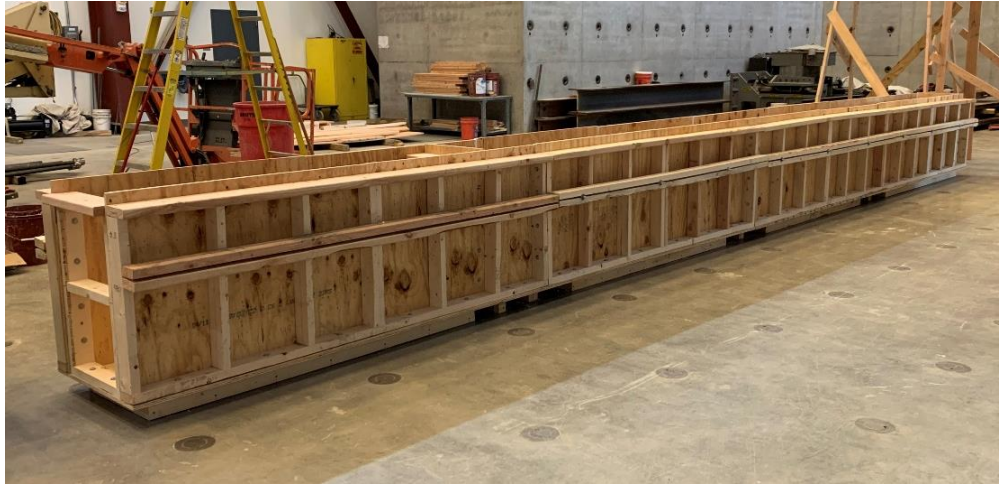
No. 14 (43 mm) bar specimen formwork
